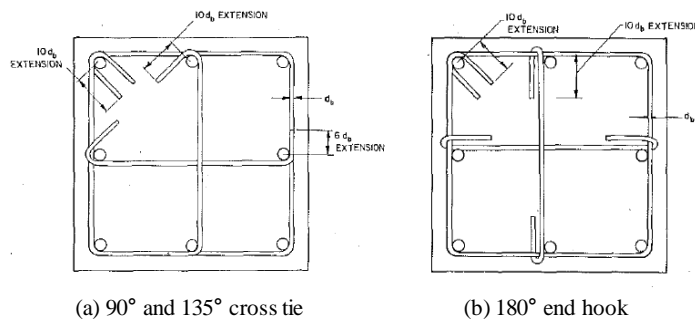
Cross tie details used in tests of Moehle and Cavanagh (1985)
